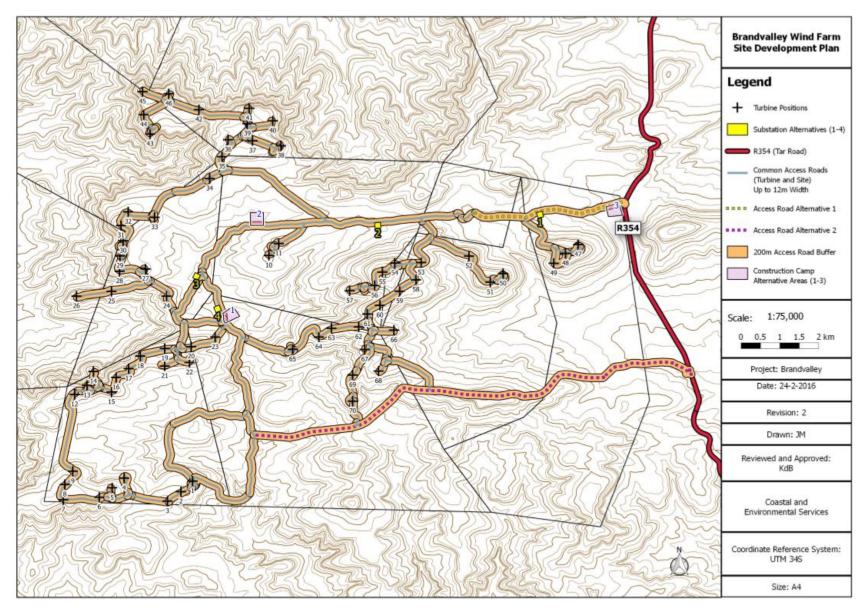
Proposed project layout in relation to topography, existing roads & tracks and the relevant farms
